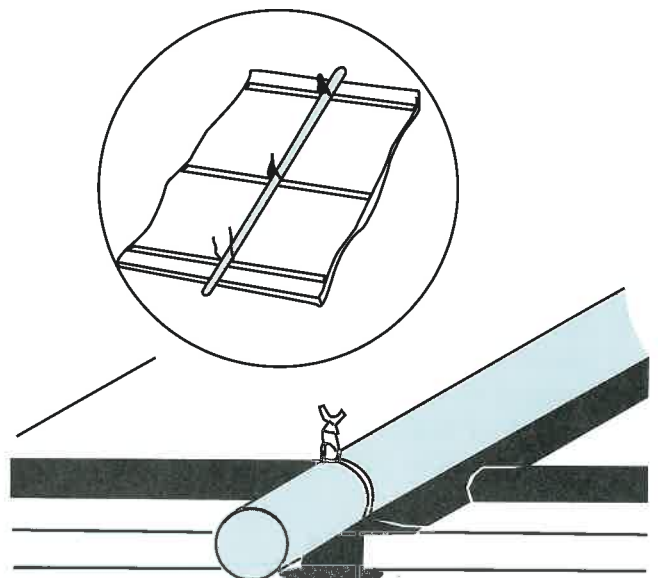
A steel rod stabilizes the leaded panel assembly. Copper wires soldered to the lead came fasten the rod.
